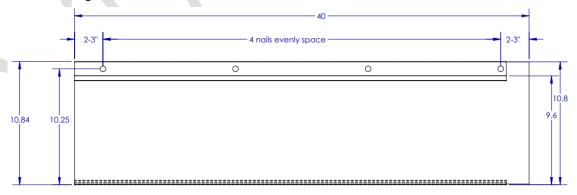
View of TimberSteel™ Metal Roof Shingle (full-shingle)
